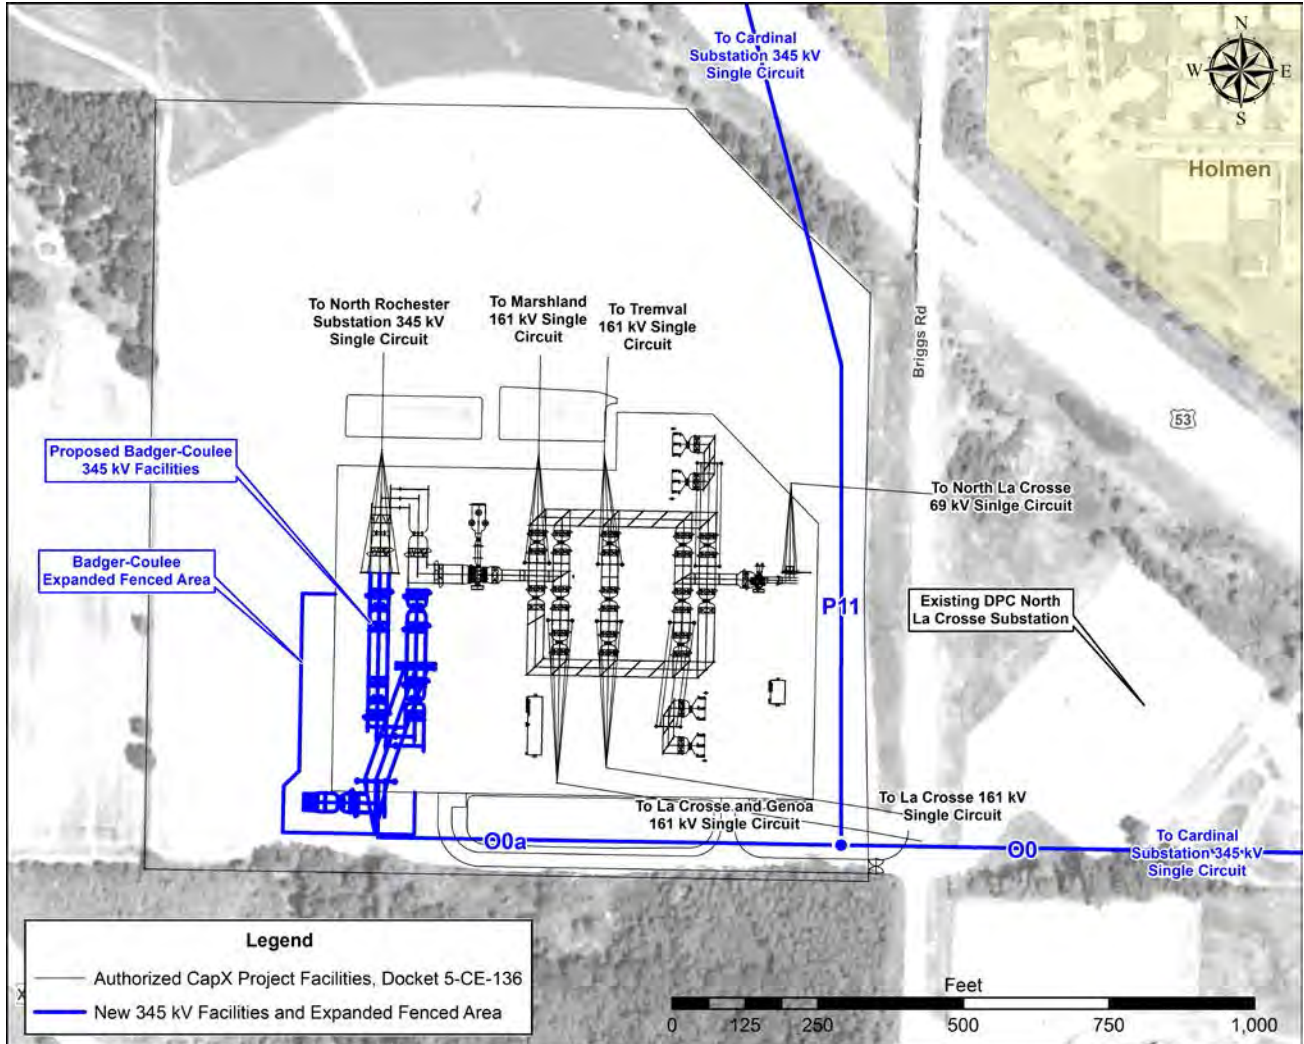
Briggs Road Substation layout – Segment Option P-east and Segment O
